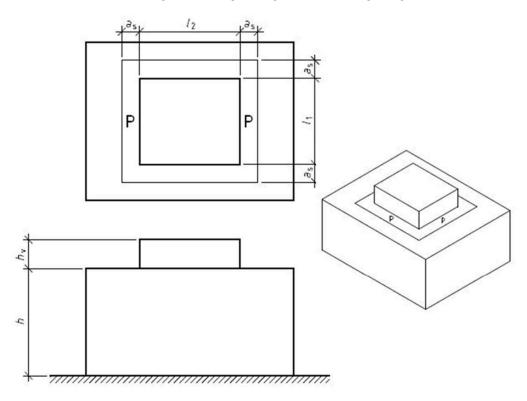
Zone of accelerated flow P; Legend: *h* roof height, h_v height of rooftop obstruction, l_1 width of rooftop obstruction, l_2 length of rooftop obstruction, a_s width of zone P [4]
